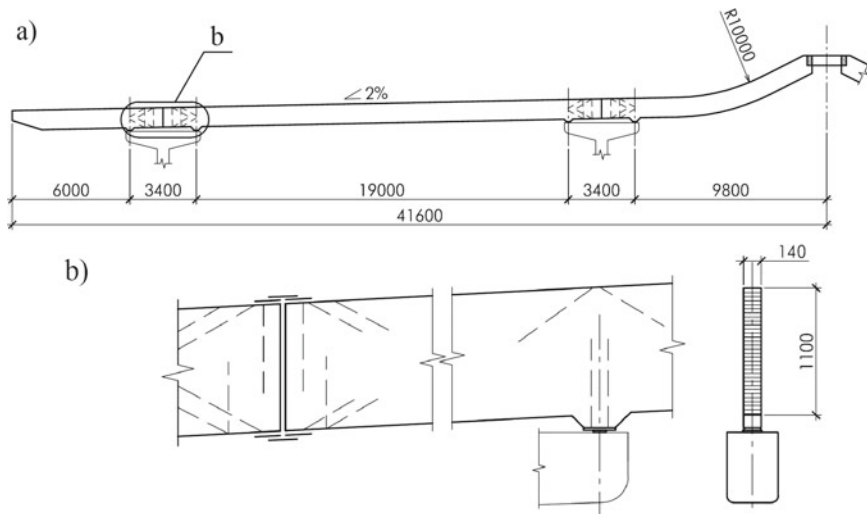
Covering beams in Lipki: (a) scheme of the continuous multispan girder; (b) structural scheme of the rigid joint and support node
